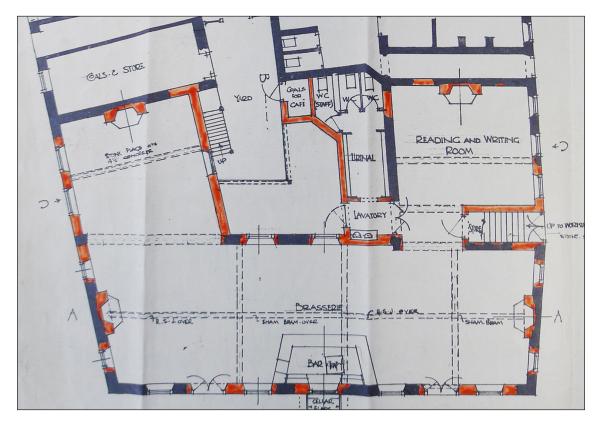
Ground-floor plan of the Pheasant, Church Street, Carlisle, drawn in 1916, showing proposed alterations (CACC Ca/E6/1/7 Reproduced under the Open Government Licence)
